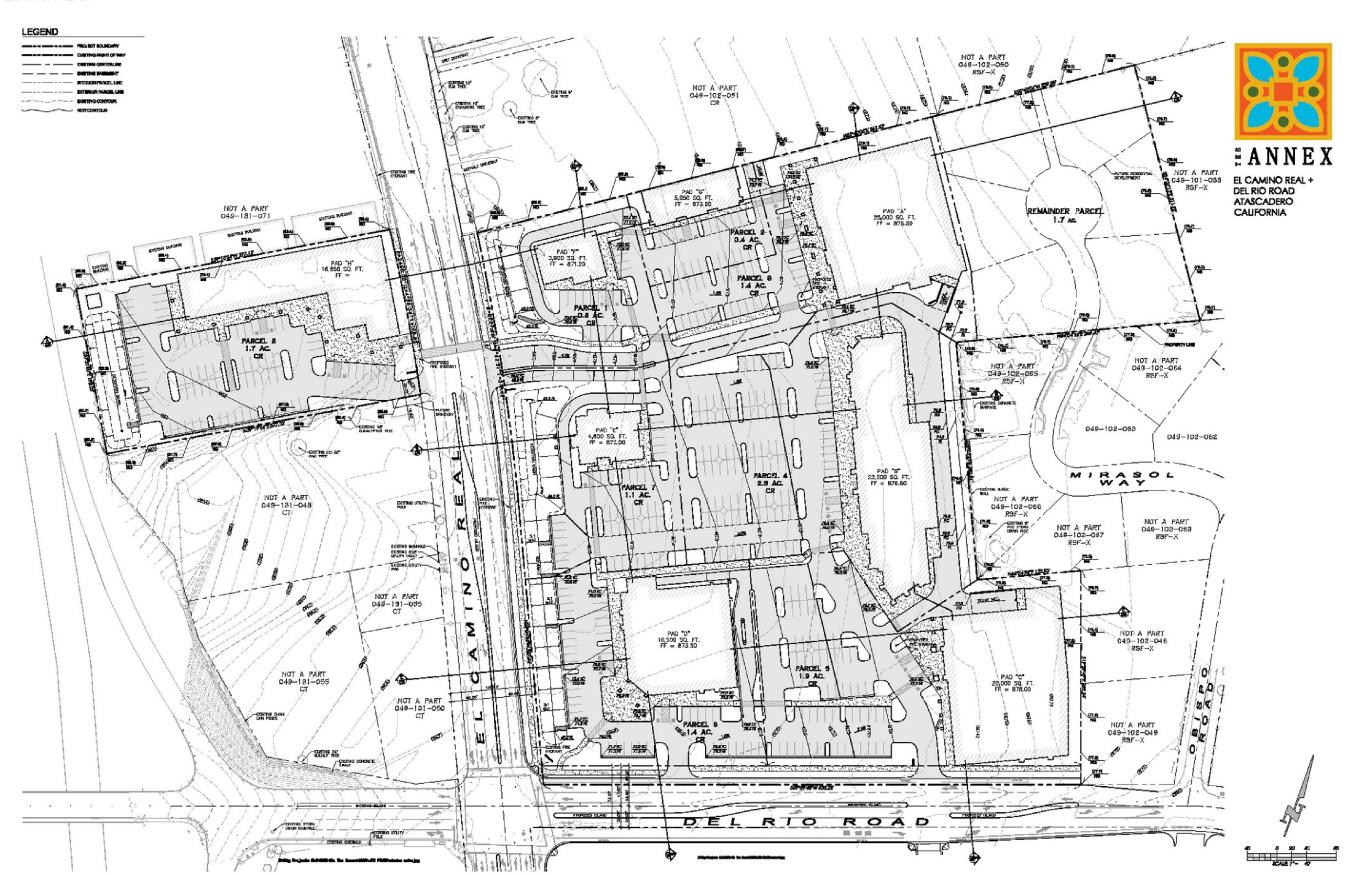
ANNEX PROJECT SITE PRELIMINARY GRADING PLAN
